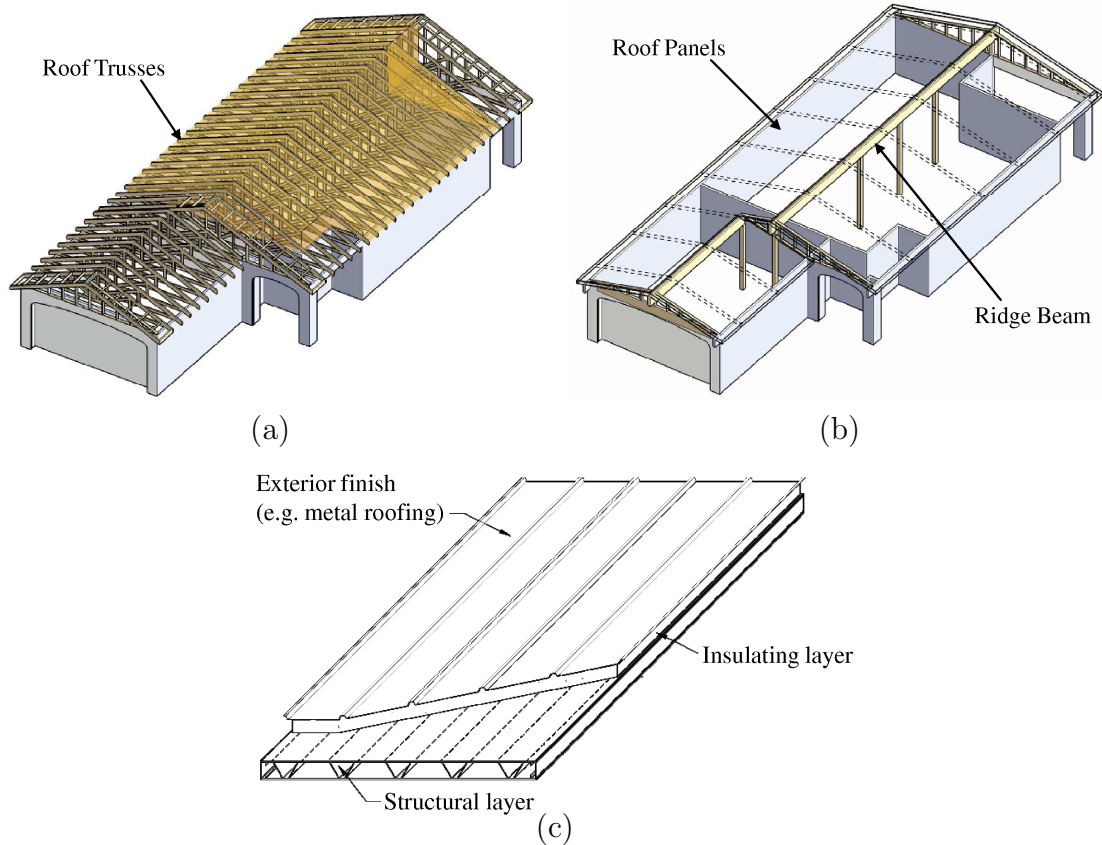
Roof structure concepts: (a) conventional (trussed) construction, and (b) panelized construction with (c) closeup of a (truss core) panel concept proposed in the literature (all figures from Reference [2]; annotations added for clarity)
